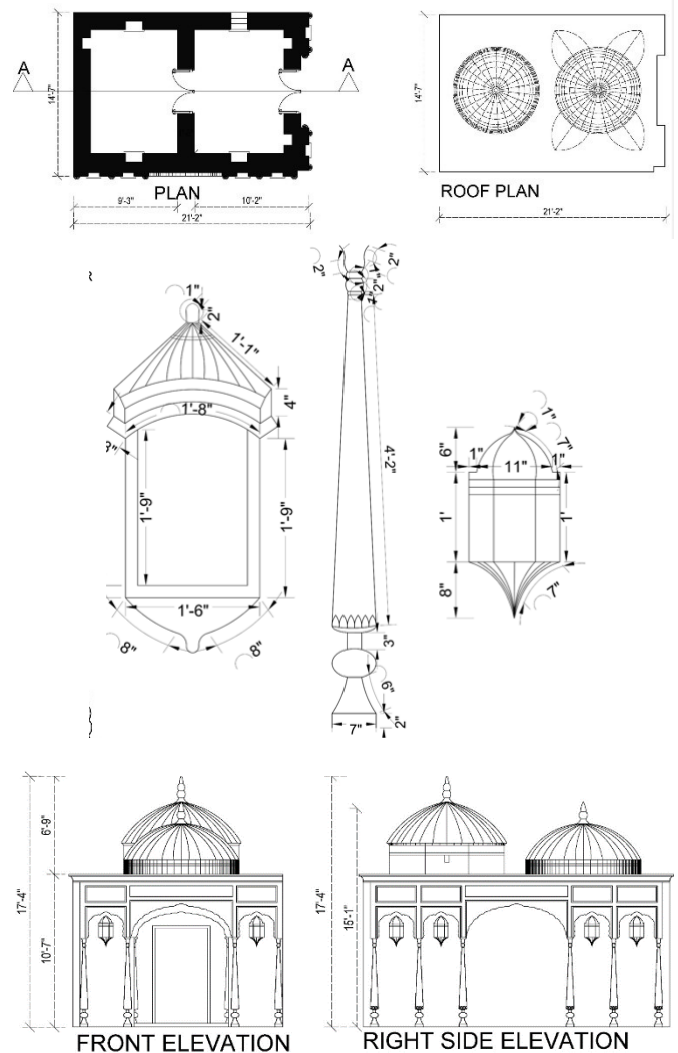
Gurdwara Singh Sahaba: Above: plans. Middle: On-site details. Below: On-site elevations. (Source: Ramsha Nazir Malik)
